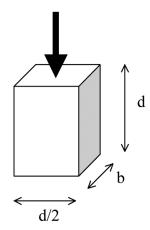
Bearing Perpendicular to the Direction of Extrusion
